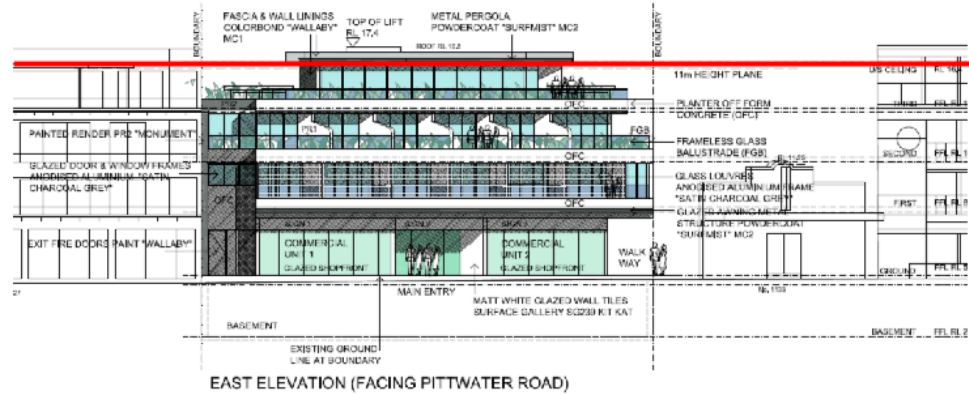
Plan (east elevation) extract showing extent of 11 metre building height breach
